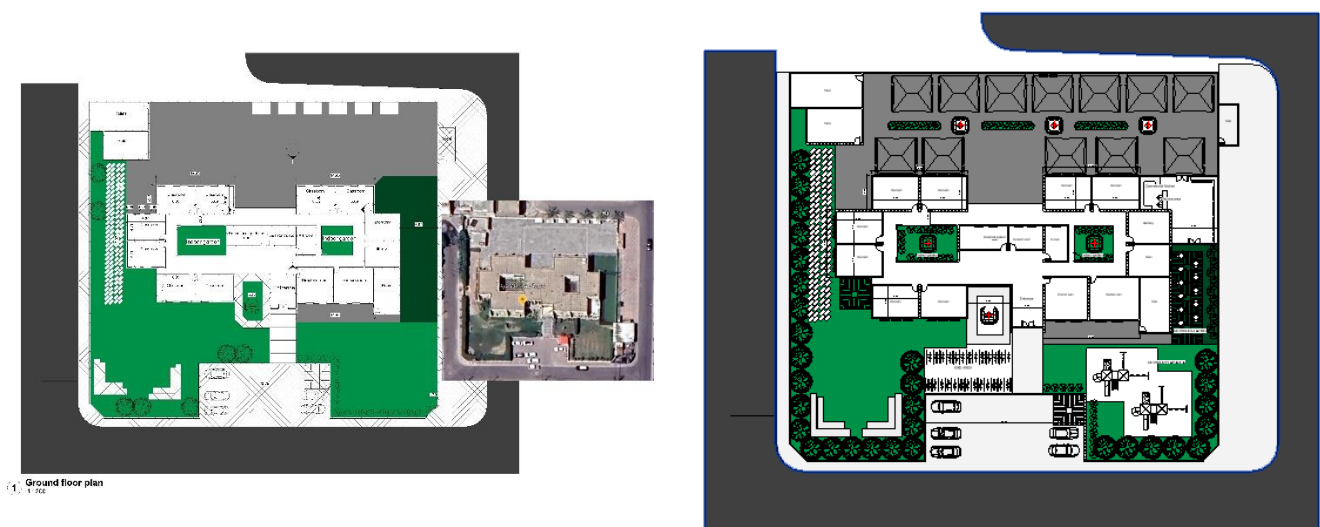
The Modern Enclosed Model: Site Plan (Google Earth), Ground Floor Plan Before Modification and After Modification (Source: Authors).
